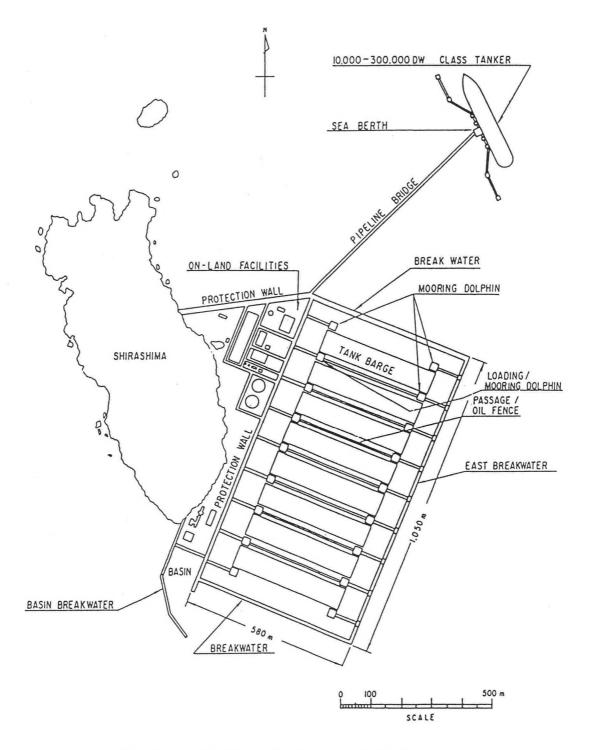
PLAN VIEW OF SHIRASHIMA TERMINAL
